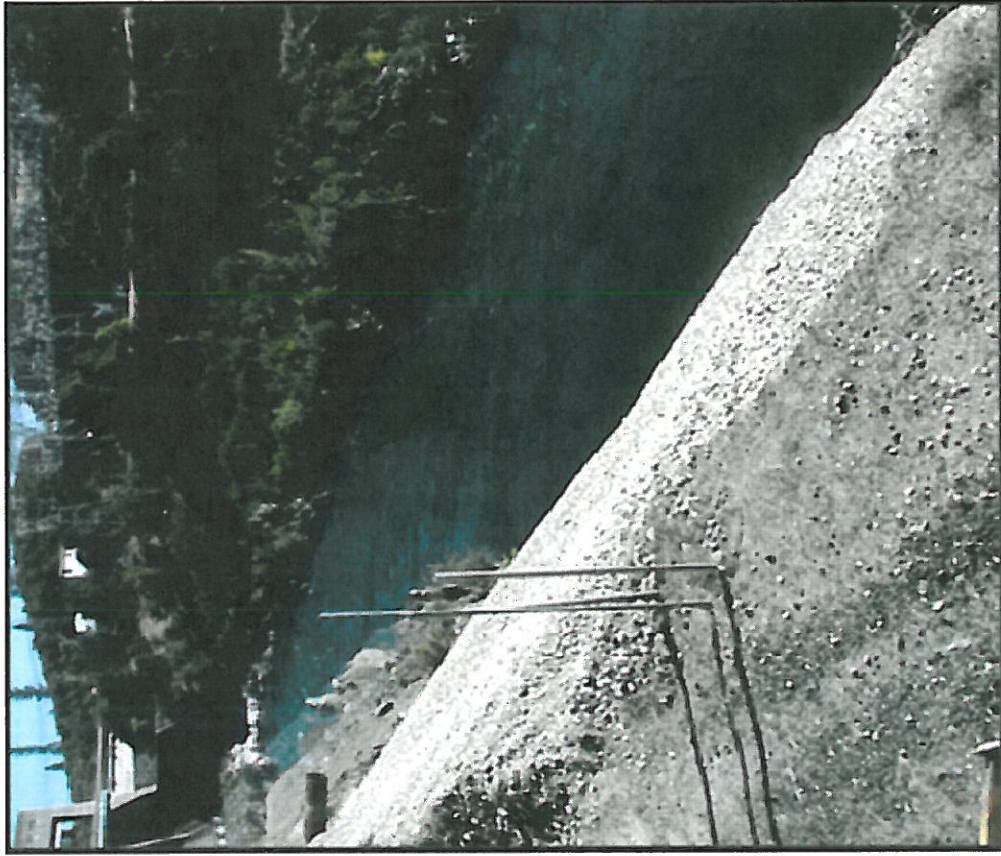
Project photographs of the Sacramento River Spawning Gravel Addition Project at Keswick Dam.
